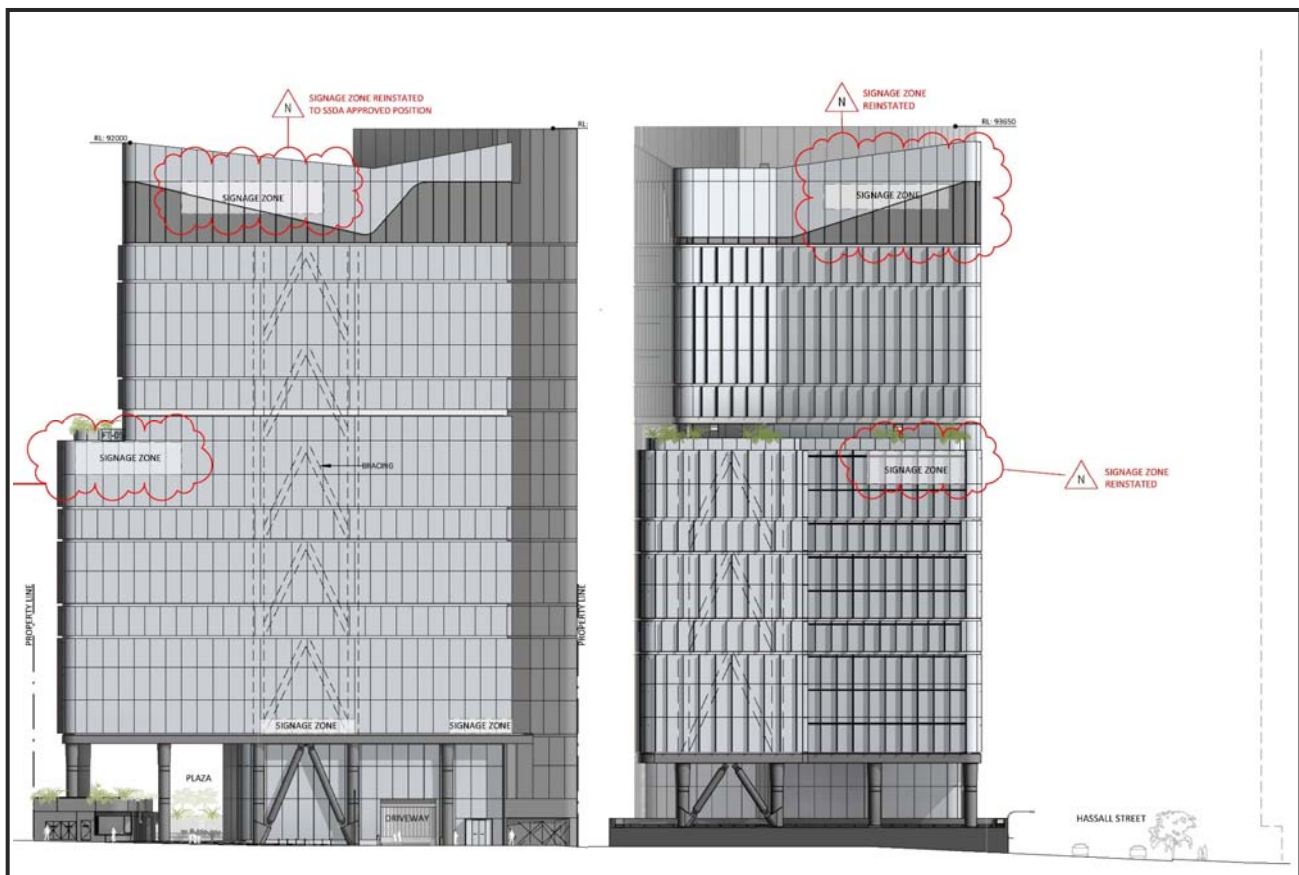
| Proposed Signage - South Elevation (left) and West Elevation (right) (Source: Modification Report)
